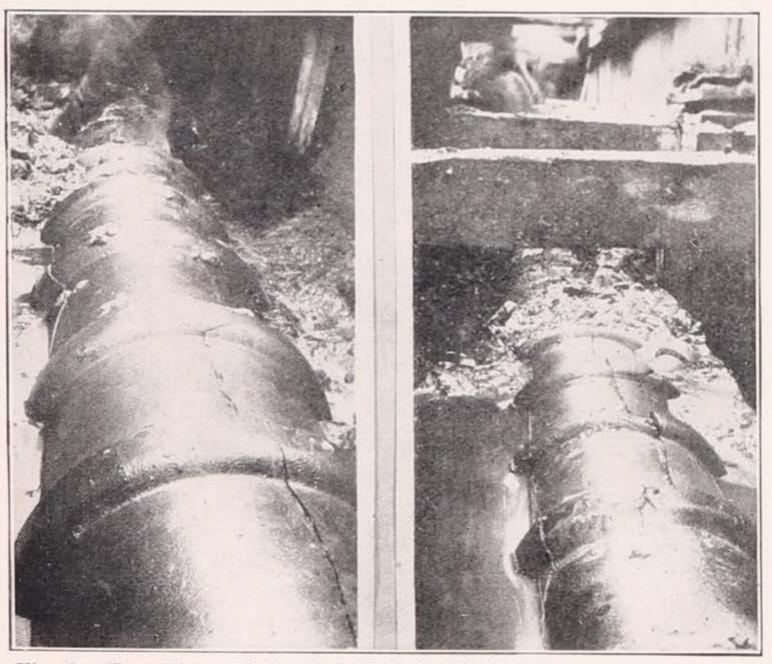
Two Views of Cracked 20 Inch Vitrified Sewer Pipe in Alley 8, Gary, Ind., 1908.
